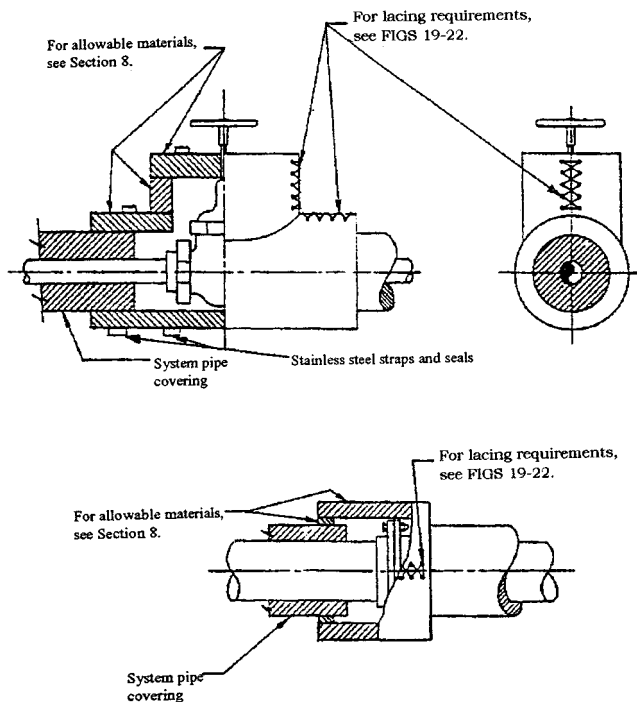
Installation of Removable Covers for Valves, Fittings, and Flanges
